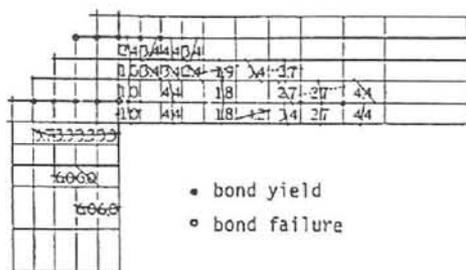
Distribution of Crack in Beam and Column [2-18]
